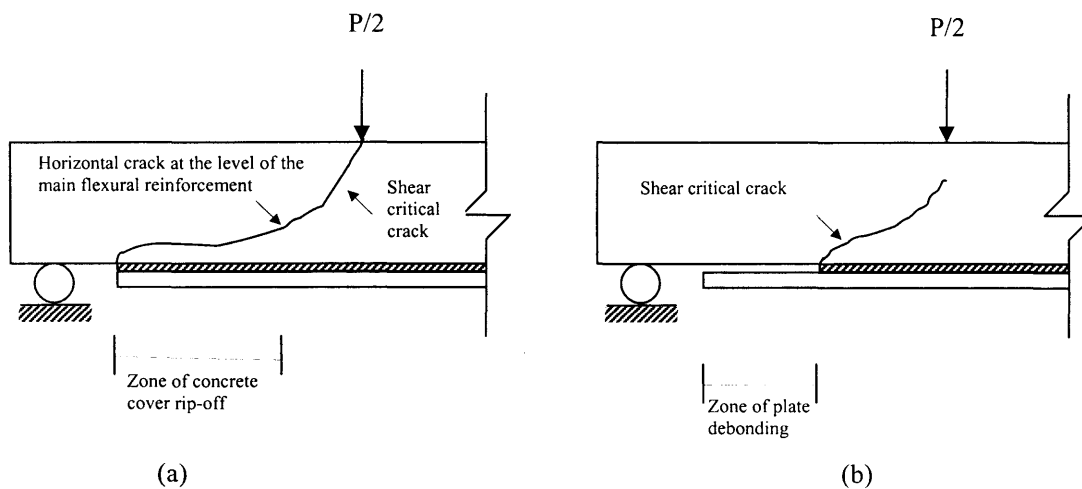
Sudden shear failures of plated beams. Failure by: (a) ripping off of the concrete cover, (b) Plate debonding (After Ziraba et al., 1994)
